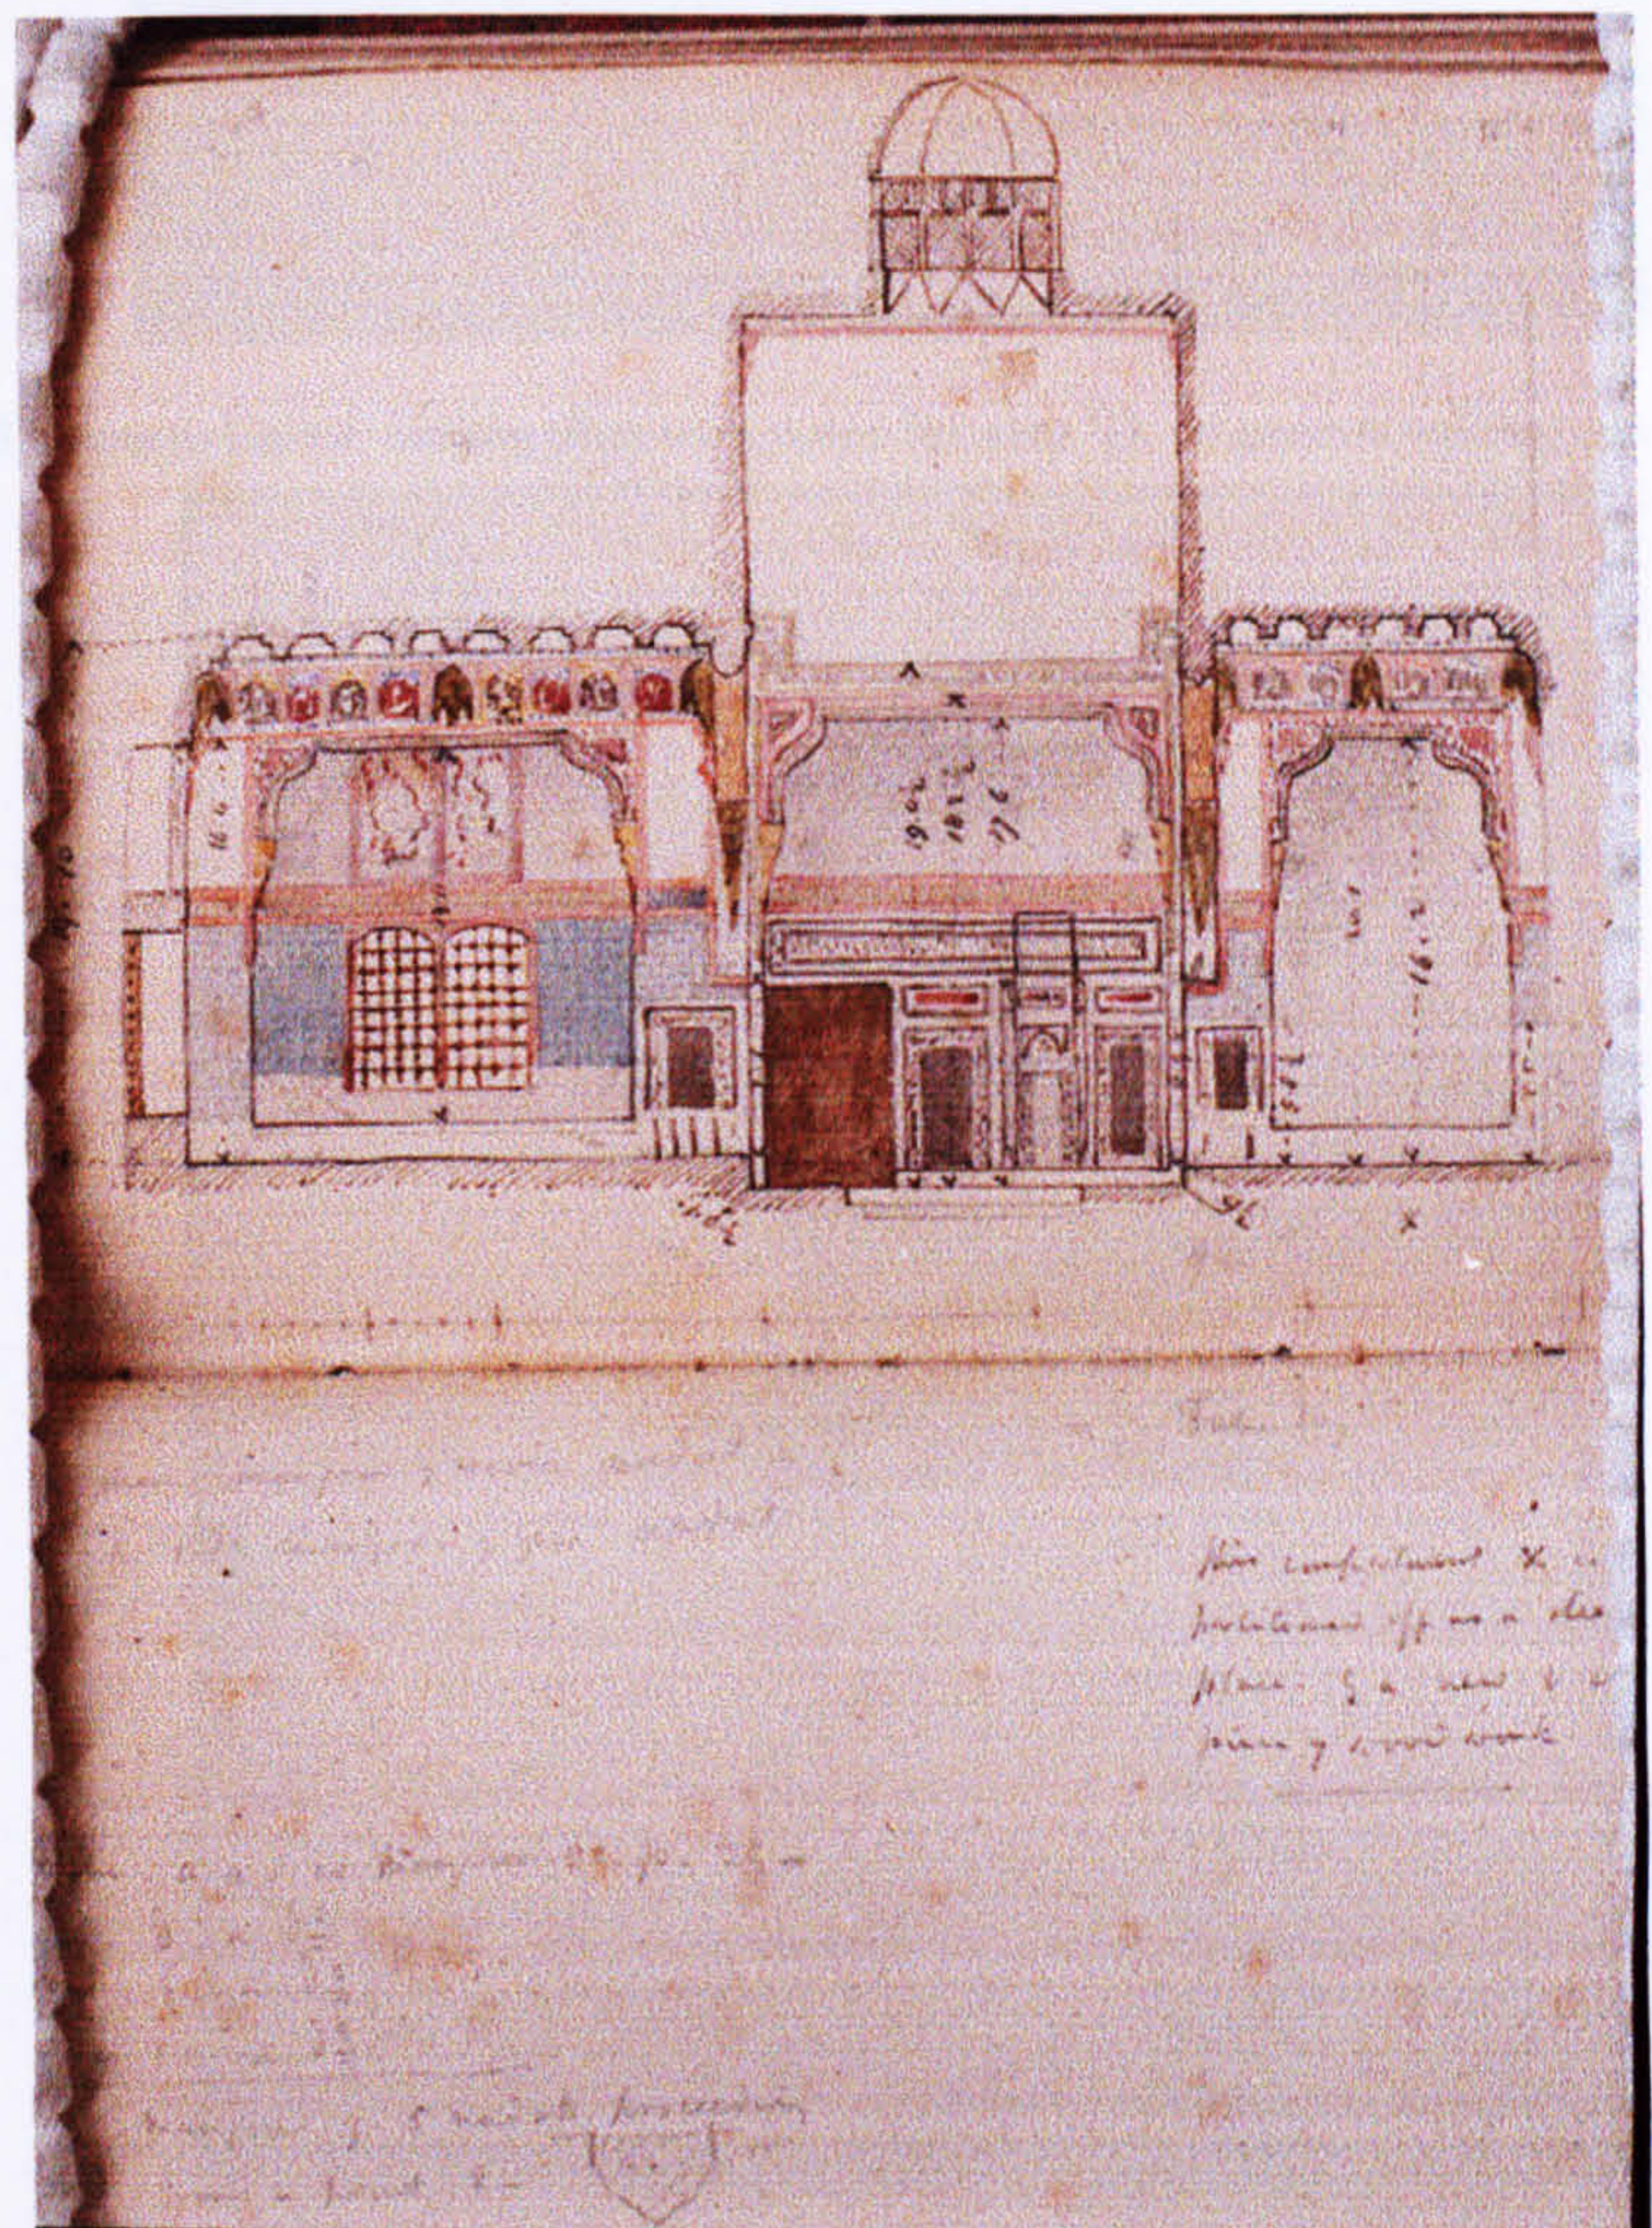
Gama el Ghoury, Cairo: longitudinal section
